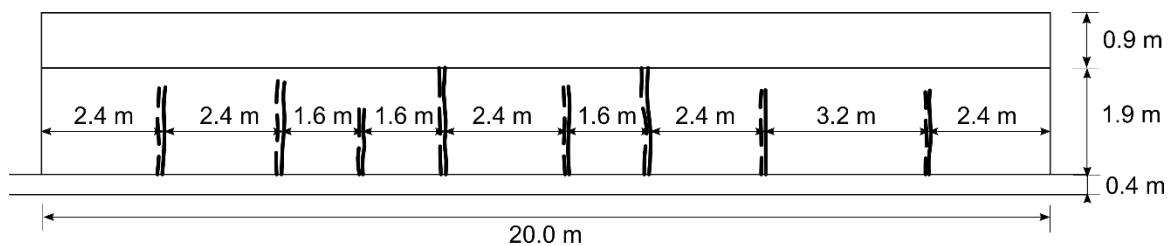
Cracking pattern in the Civaux mock-up wall [36][38].
